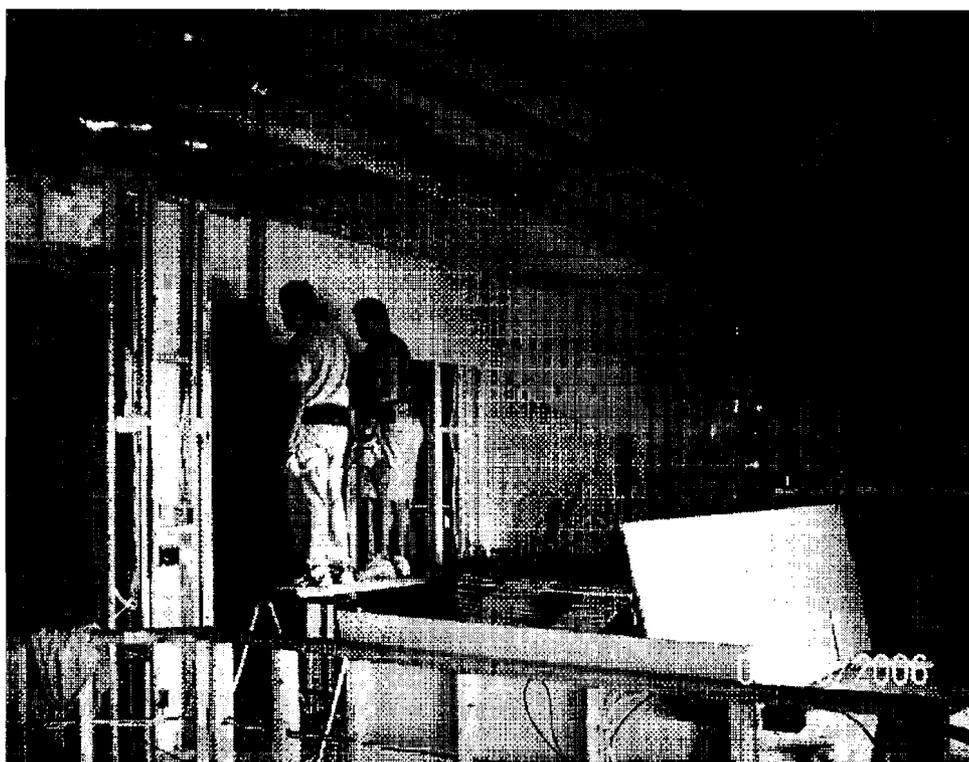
Photograph of workers installing drywall inside consumer's home
